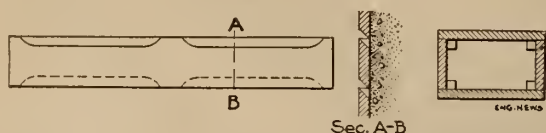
HORIZONTAL SHEETING FOR SINKING PITS
